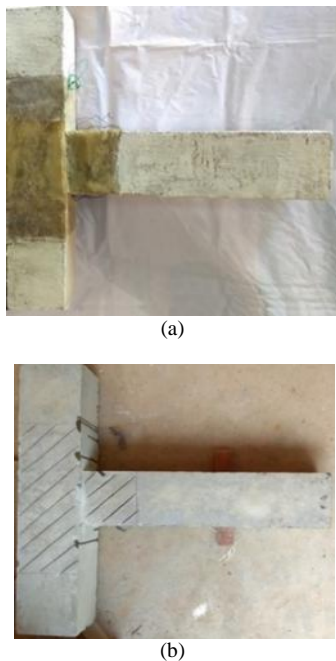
(a) Externally bonded beam-column joint, (b) Grooves cut on beam-column joint
